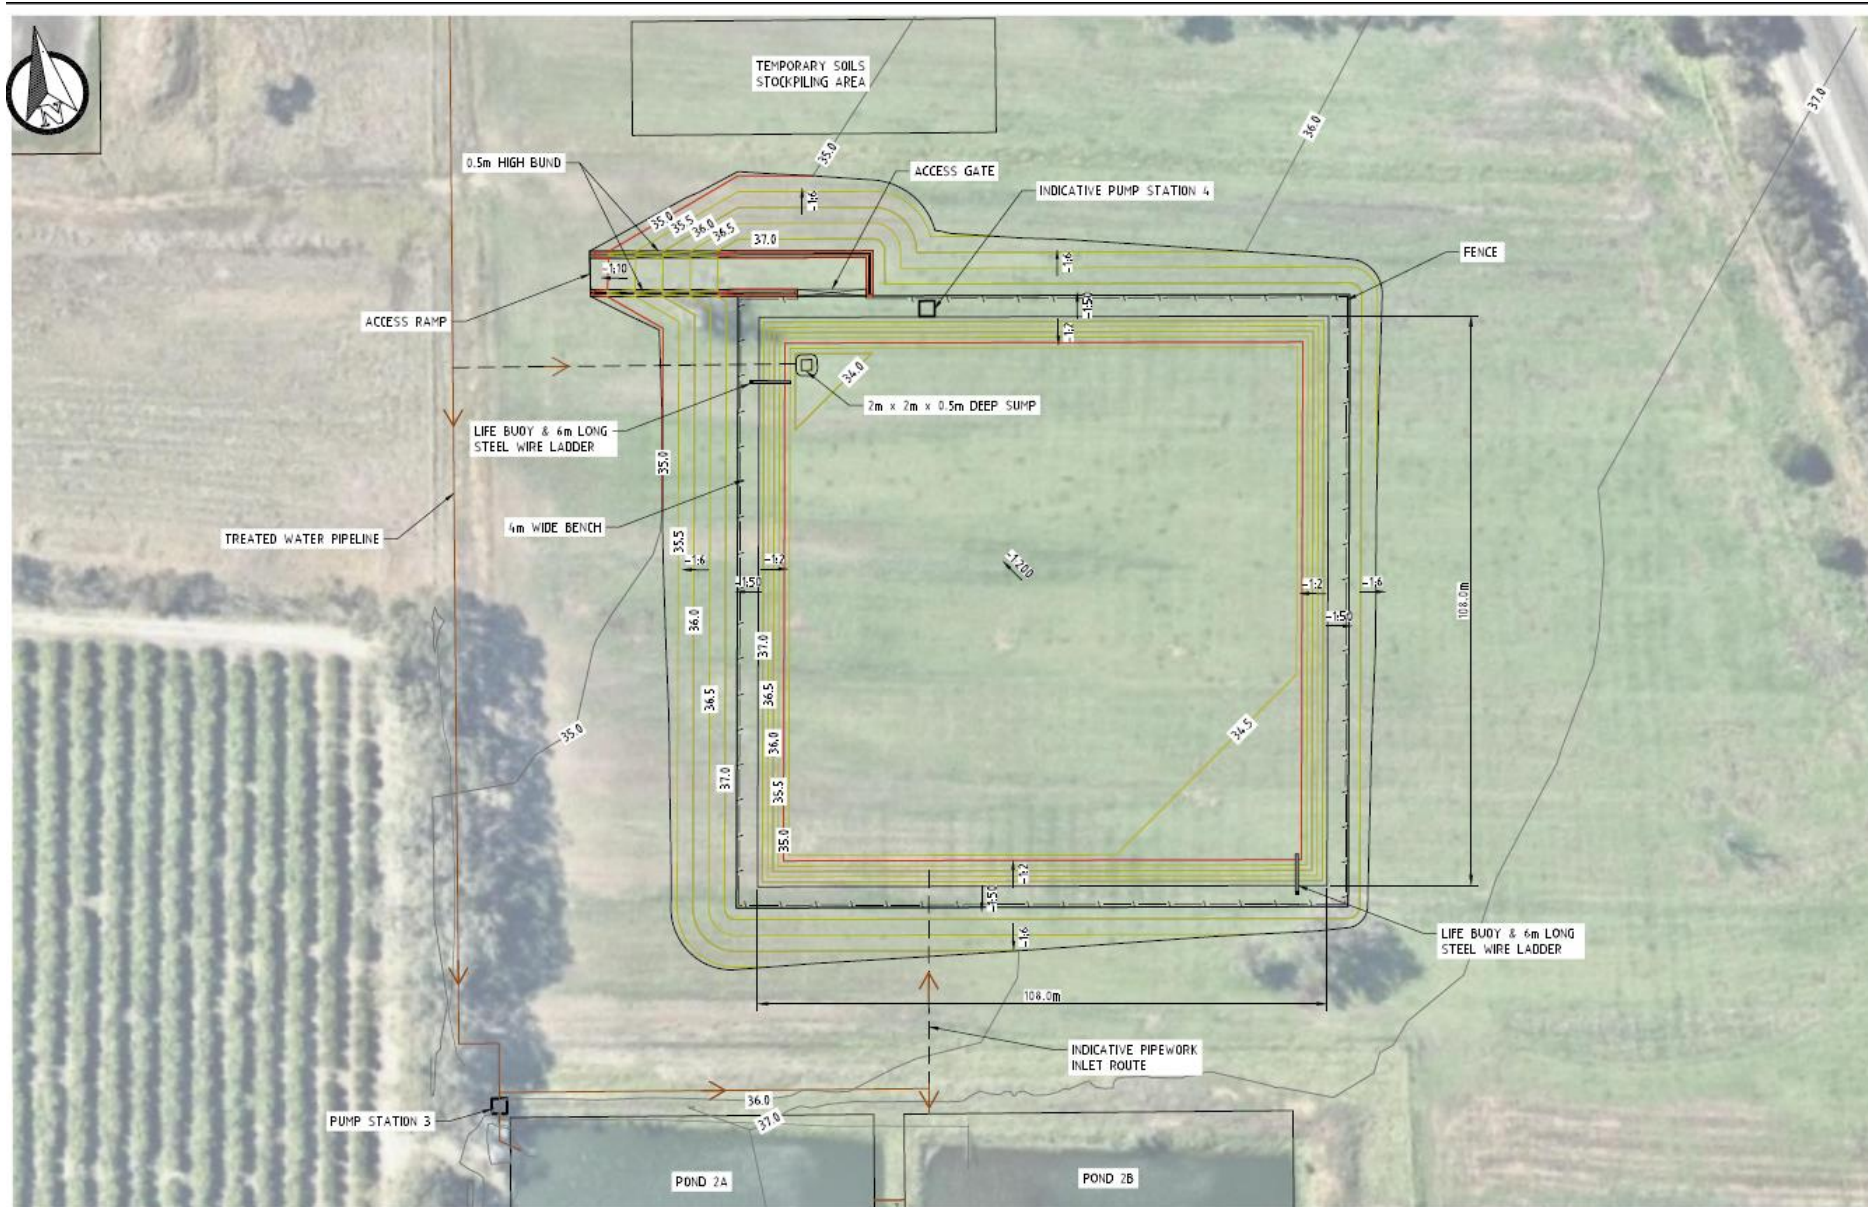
Indicative design of Pond 3, including location of new and existing pipelines.
